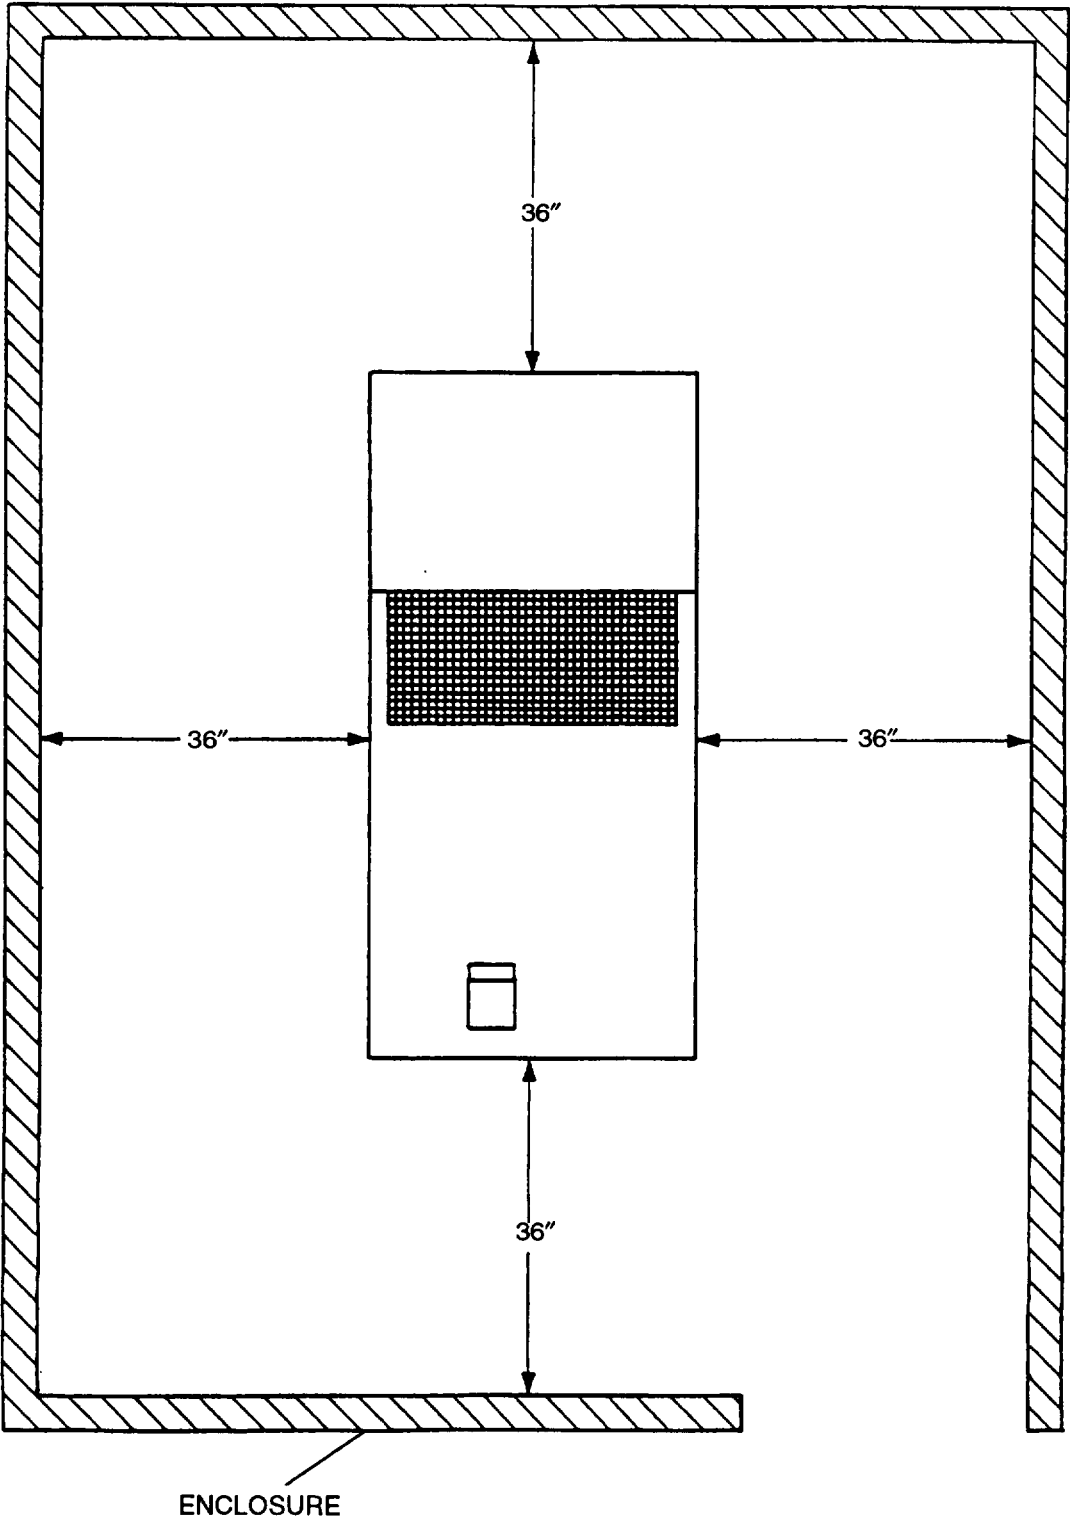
Minimum Enclosure Clearance Measurements
